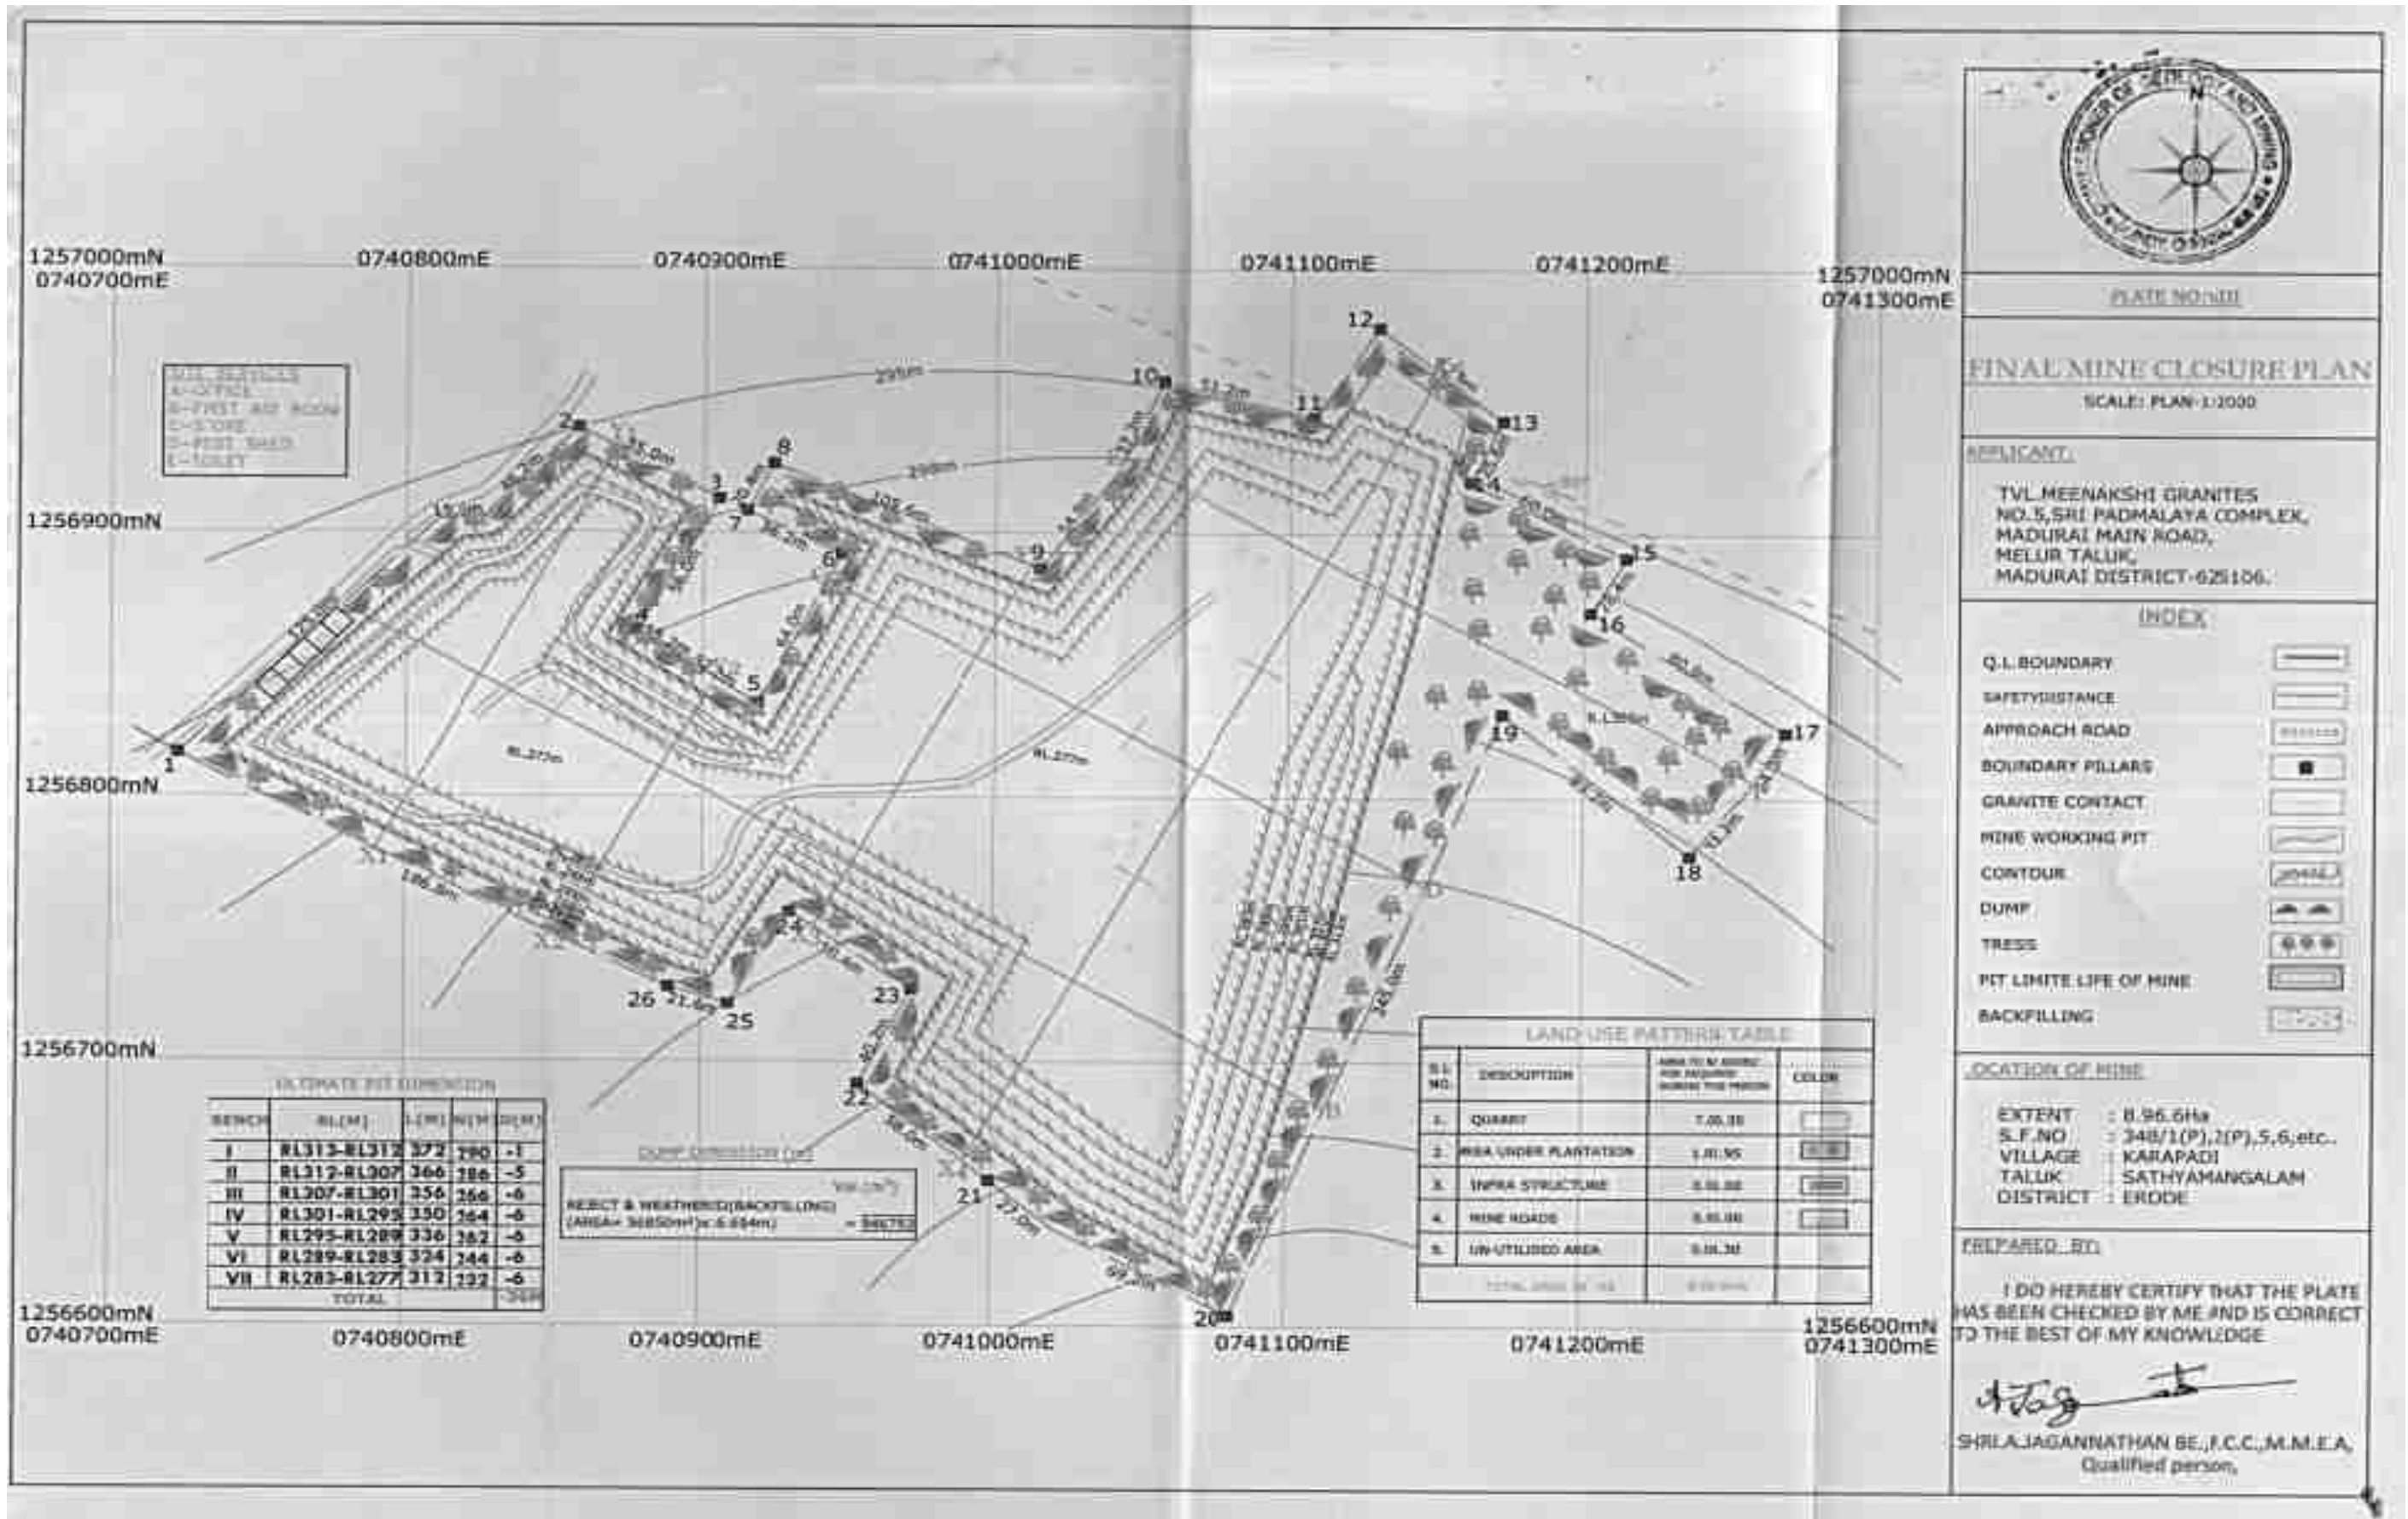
Conceptual mining plan/ Mine Closure Plan
